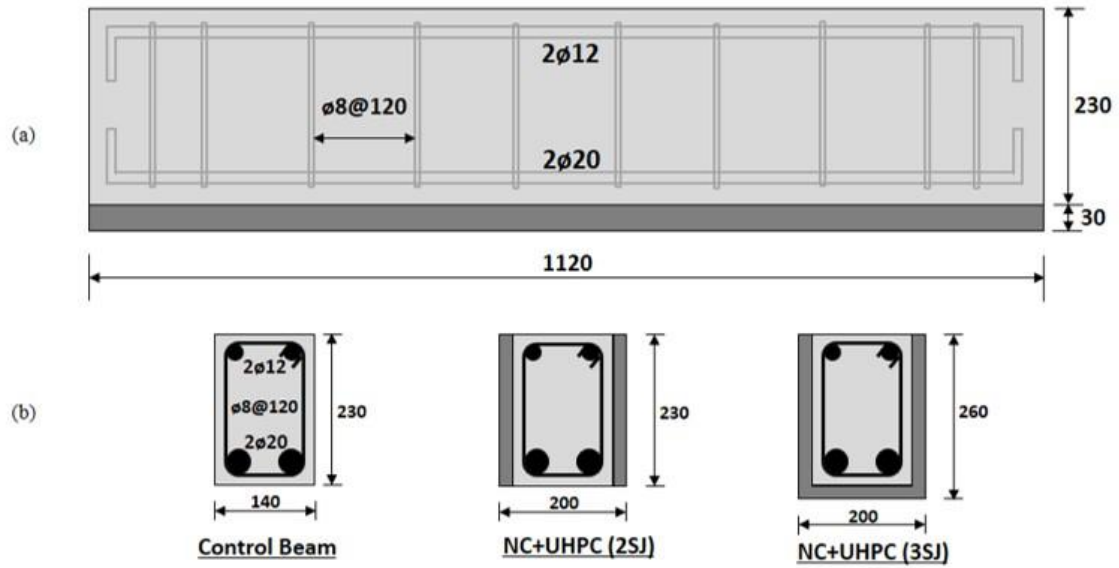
(a) RC beams details, (b) strengthening configuration
